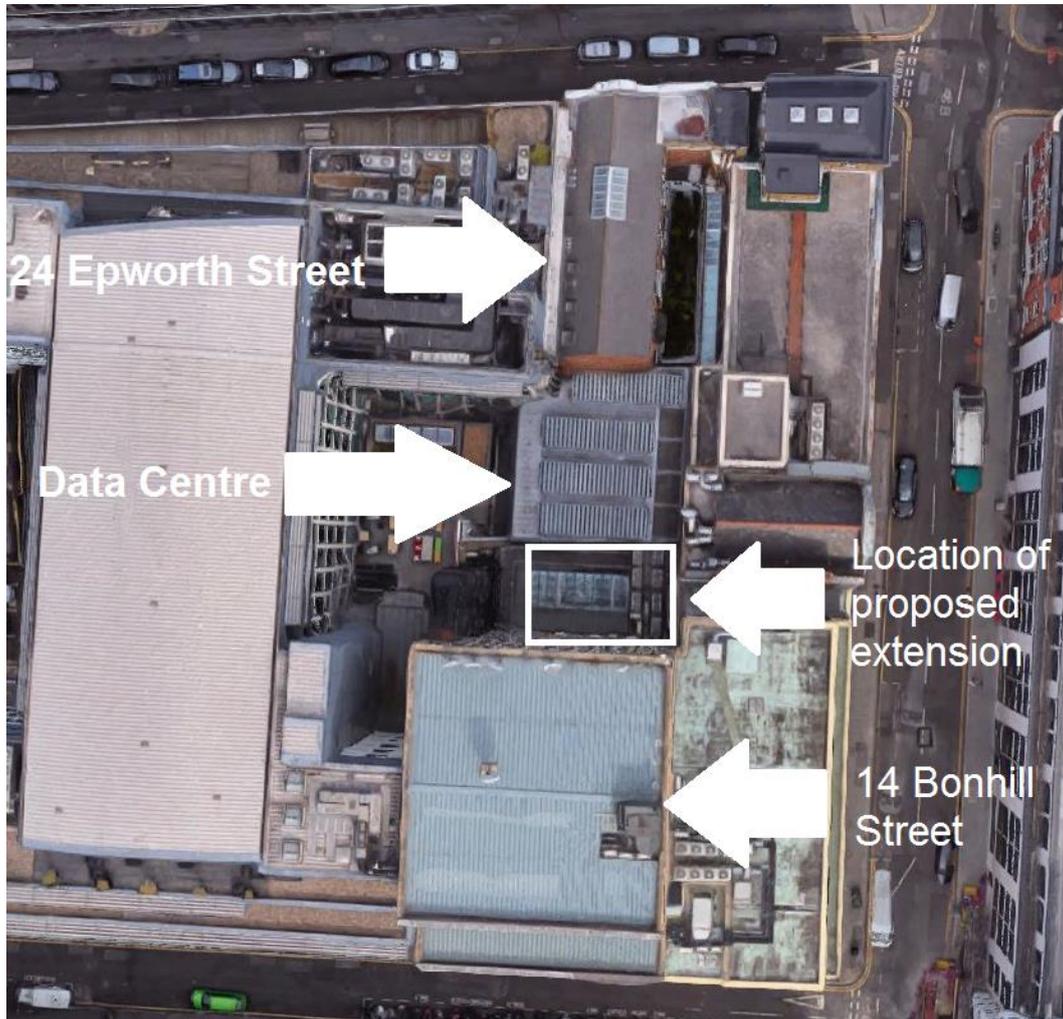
Aerial view of site indicating the location of the proposed extension, the location of the existing plant equipment for the Iomart data centre at 16-22 Epworth Street and the nearest residential units at 24 Epworth Street.
